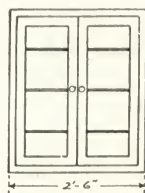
DETAILS OF DESIGNS AND SIZES OF WHITE HOUSE SECTIONAL UNITS
